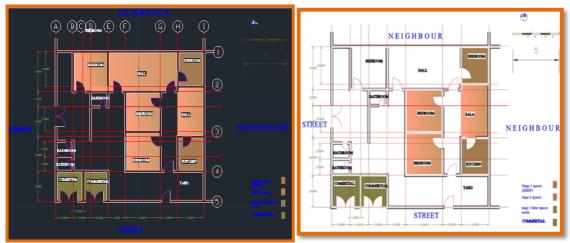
Mukhatar Mustafa house Ground floor plan (Source: Author)
